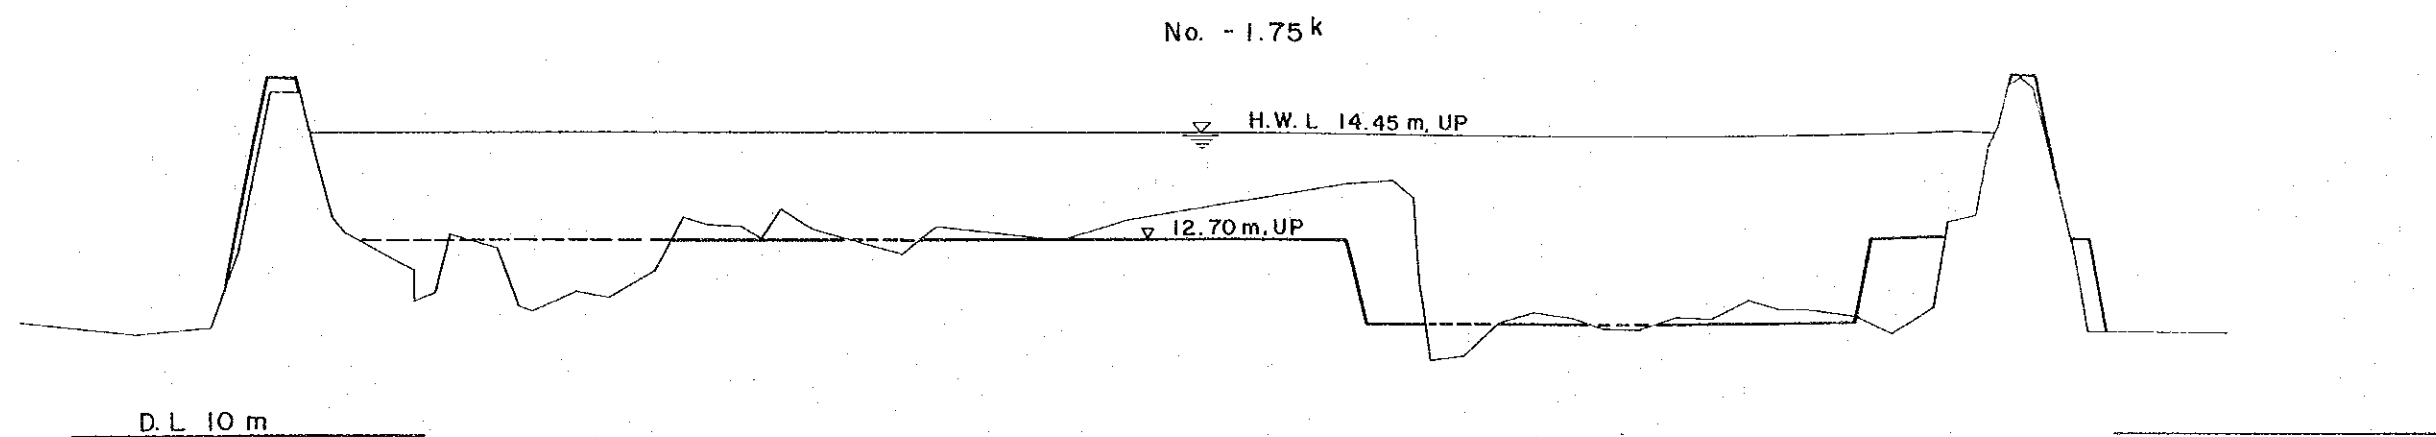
Typical Cross-Section of Embankment (Ular River)
